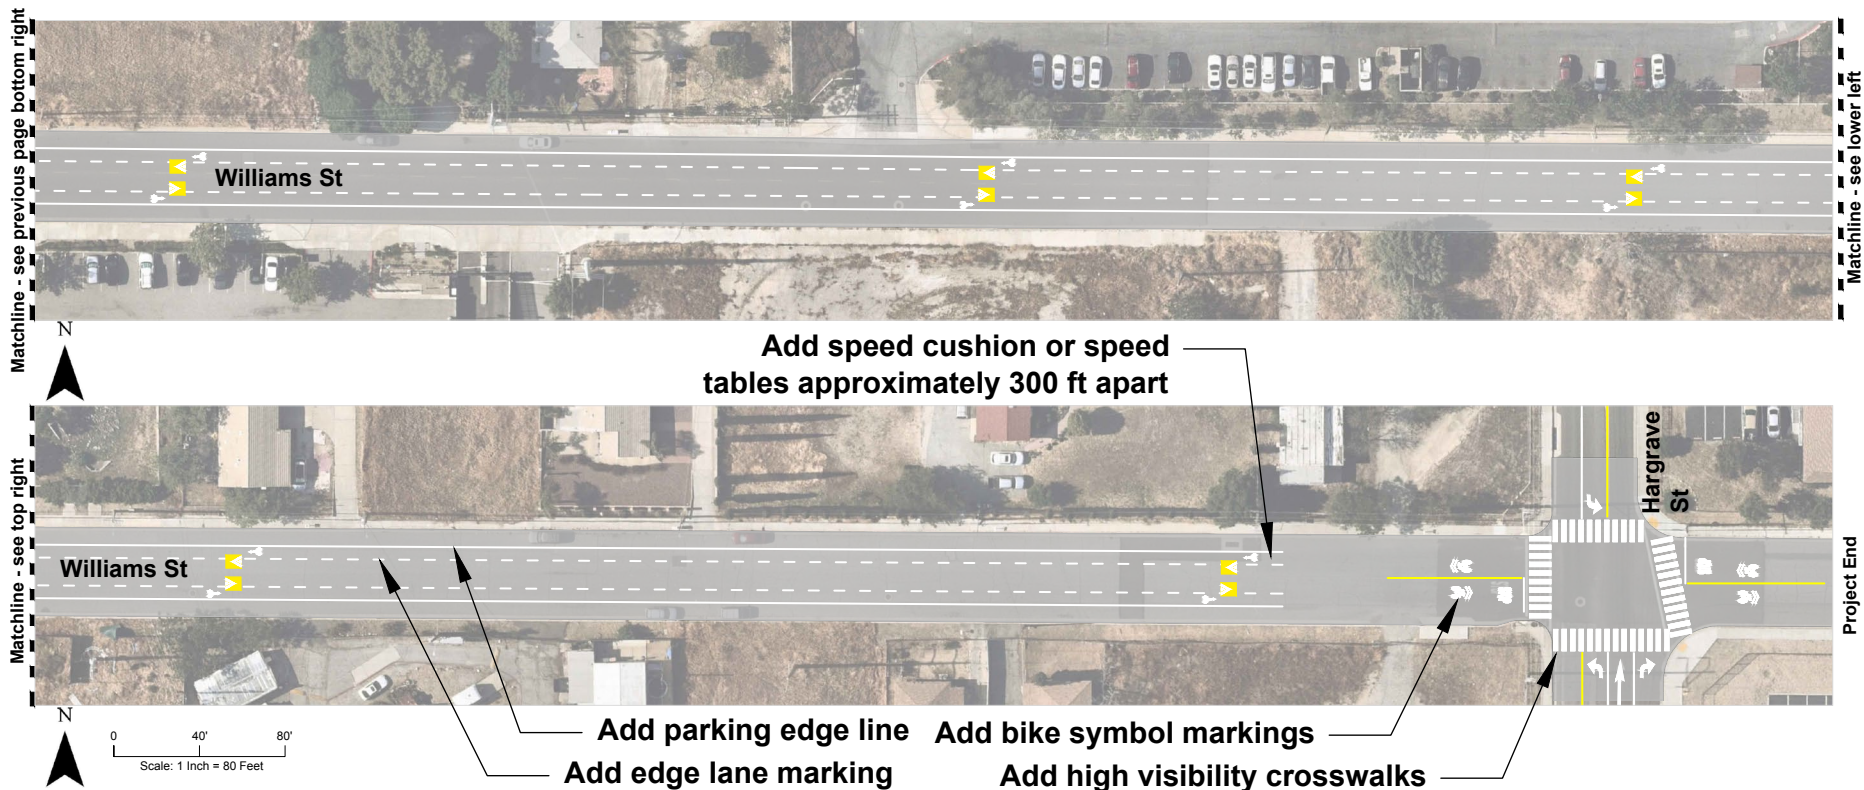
and Figure 4-4 show recommended improvements for the Williams Street corridor. The proposed improvements along Williams Street include turning the existing two-way road (from 4th Street to San Gorgonio Avenue and from Alessandro Street to Hargrave Street) into an edge lane road with Class III bicycle route facilities and bicycle symbol markings on both sides of the corridor and installing a two-way Class IV bikeway with bicycle symbol markings and curb refuge islands on the north side of the segment from San Gorgonio Avenue to Alessandro Street. The proposed Class IV bikeway along this corridor would connect with Class IV bicycle facilities on other corridors to form a loop. Other proposed improvements include installing high-visibility crosswalks at most intersections, speed cushions or tables, parking edge lines, and edge lane markings throughout the segment.
